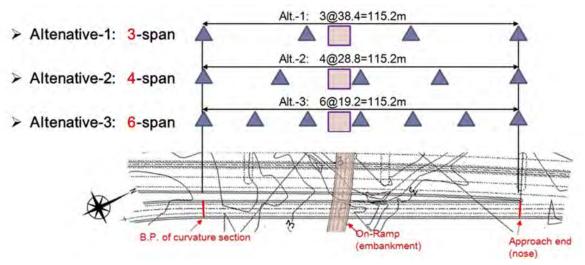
Control Points for Bridge Length and Shan Arra	andement
